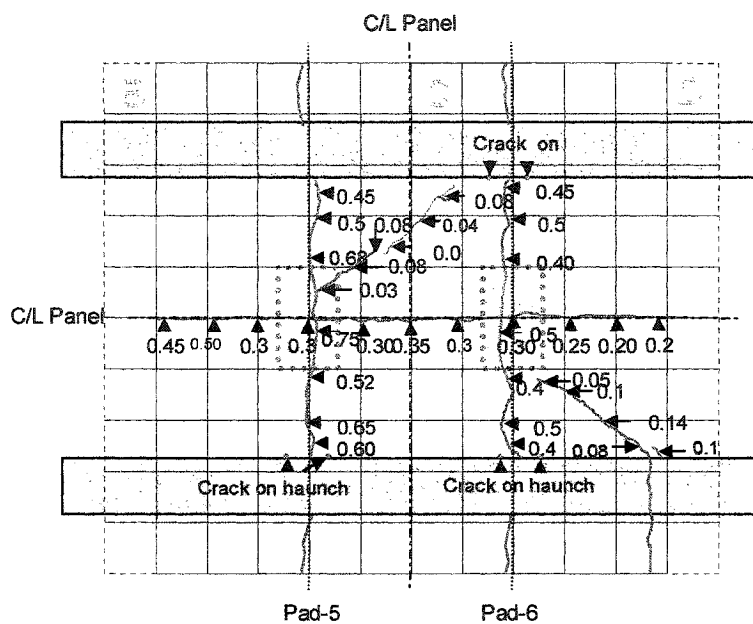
Panel C: Crack Pattern on Soffit after 900 Load Cycles
